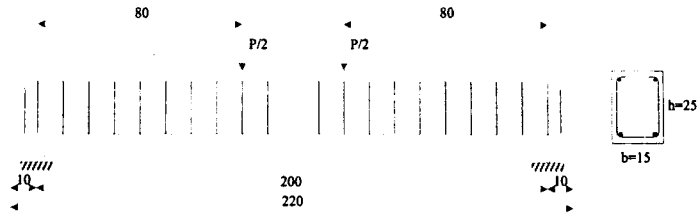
Reinforcement detail and section dimension of beam (unit : cm)
